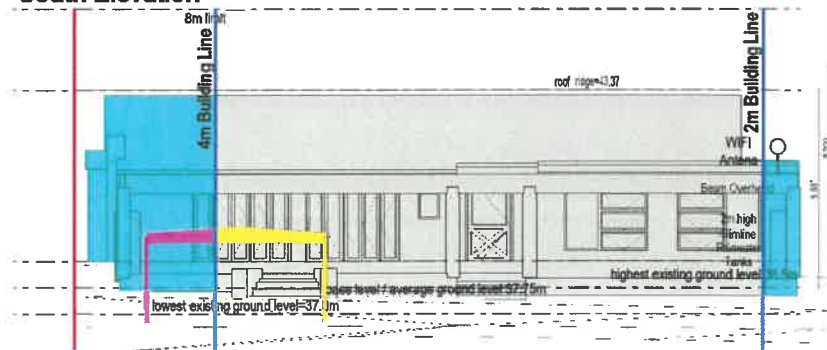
Elevations Illustrating Building Line Contraventions to be Legalised
